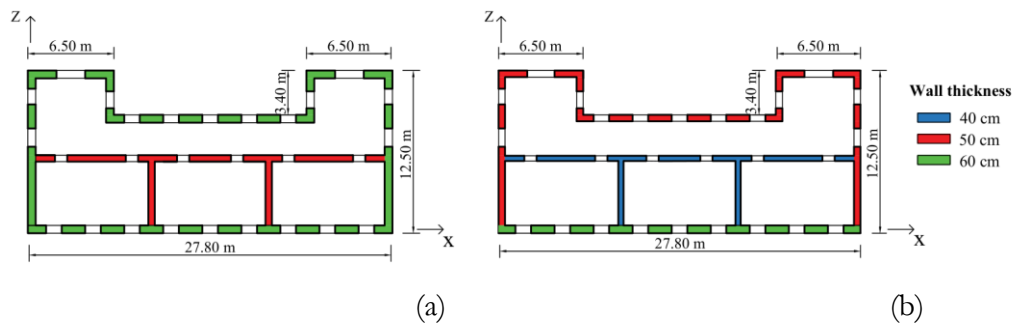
Geometrical dimensions of the case study structure: a) Ground floor; b) First floor.
